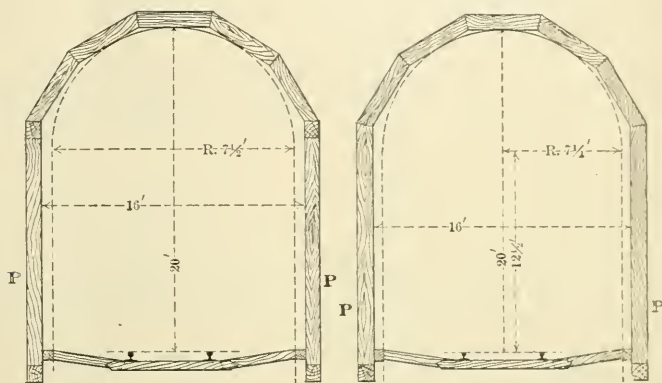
WITH WALL-PLATES. FIG. 2.—WITHOUT WALL-PLATES.
